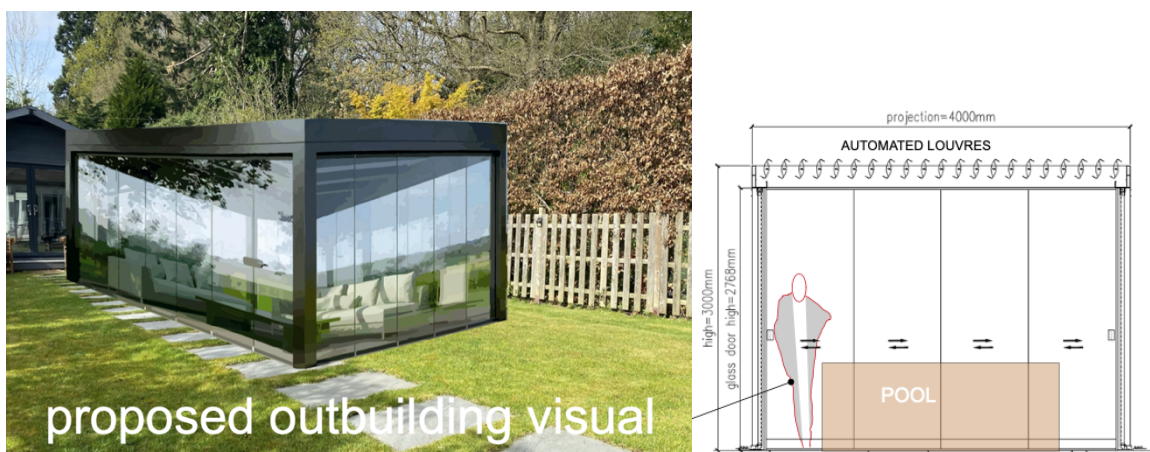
Proposed “Pergola” style outbuilding with retractable louvered flat roof and no “eaves”
